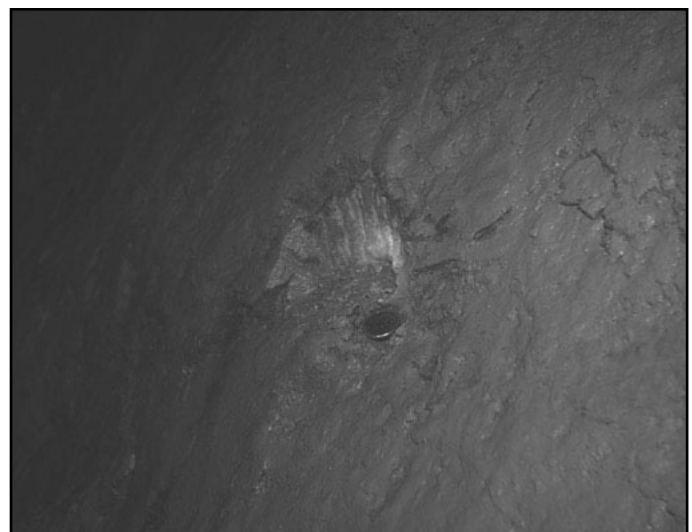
Candle notch in fault defined, NW footwall of southern section of workings.
